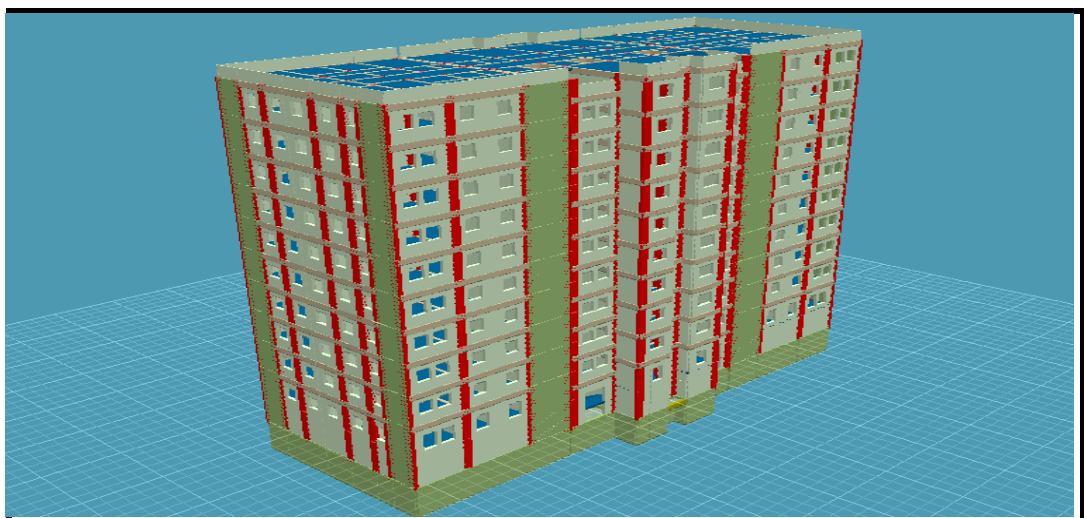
The 3D View of Buildings with Ten Stories and Shear Wall System
